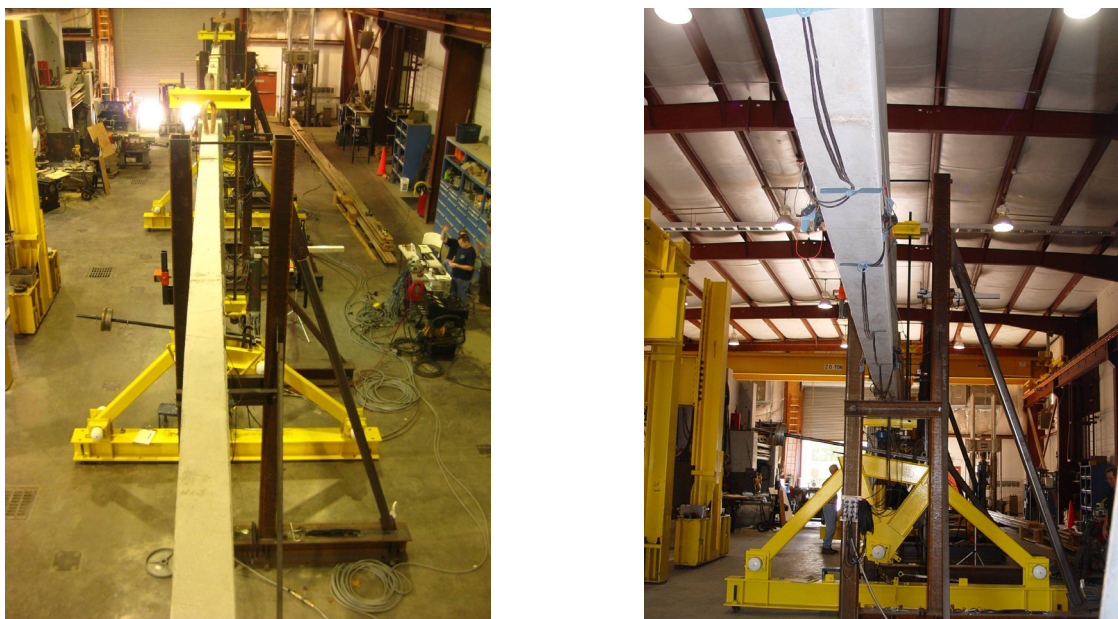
Test girder in buckled configuration, test A-45-0-1:
